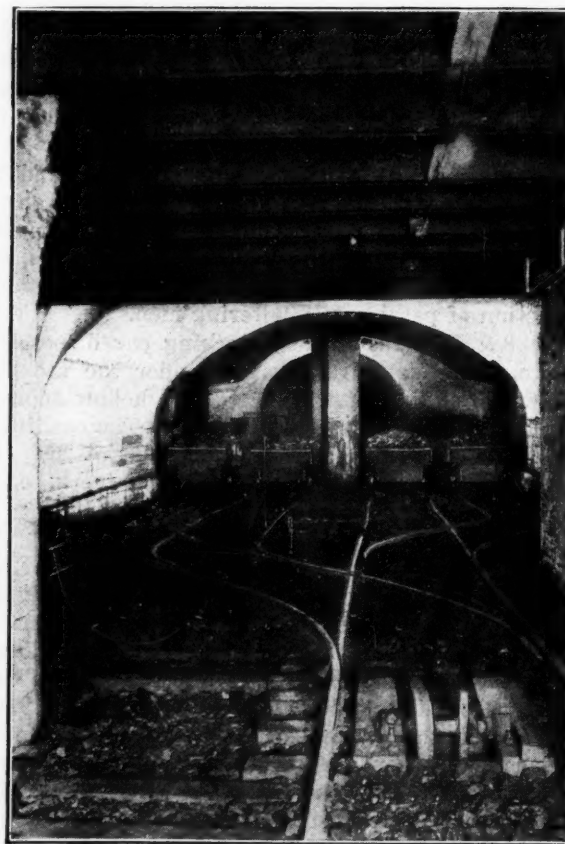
LOAD SIDE OF SHAFT BOTTOM
